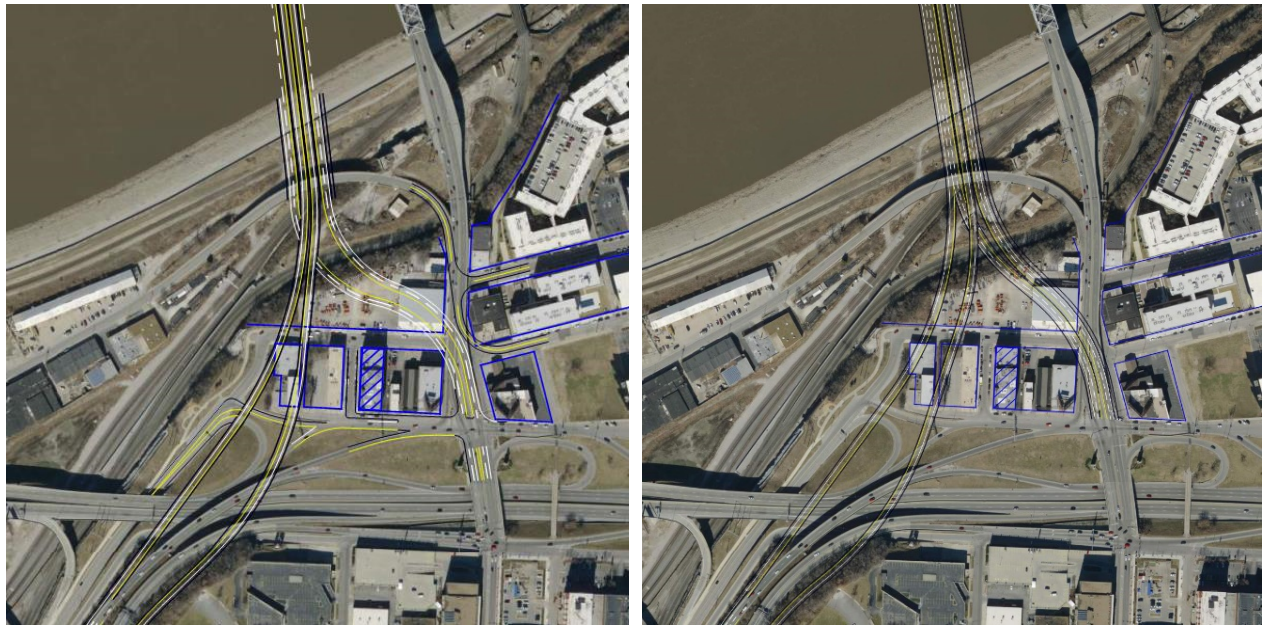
Ramp Concepts for Central Alignment with Direct Connection to I-35
